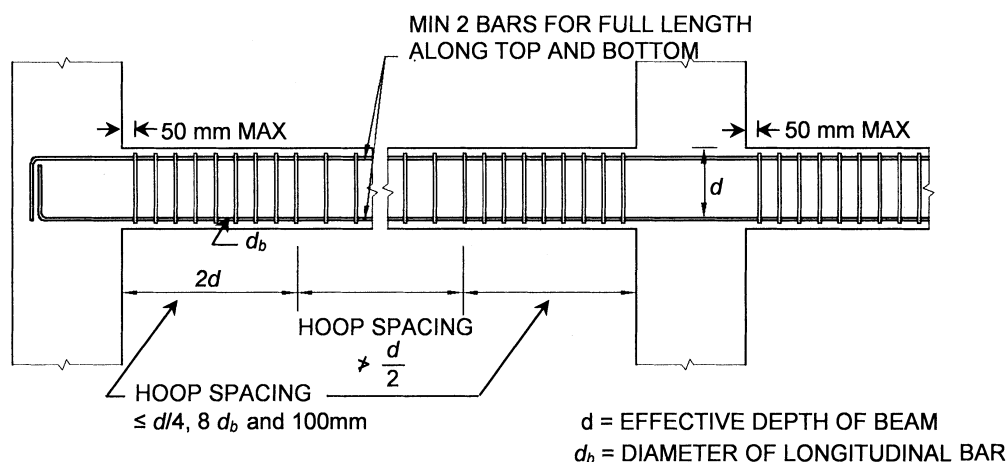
DETAILS OF TRANSVERSE REINFORCEMENT IN BEAMS
